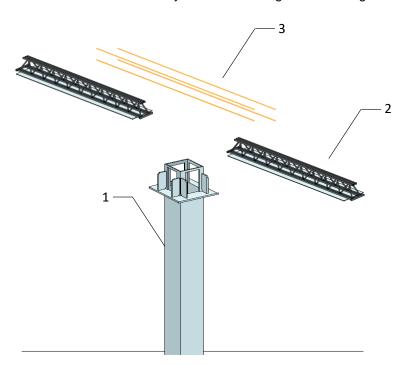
Schematic view of a joint: (1) column, (2) beam and (3) additional loose reinforcing bars.
